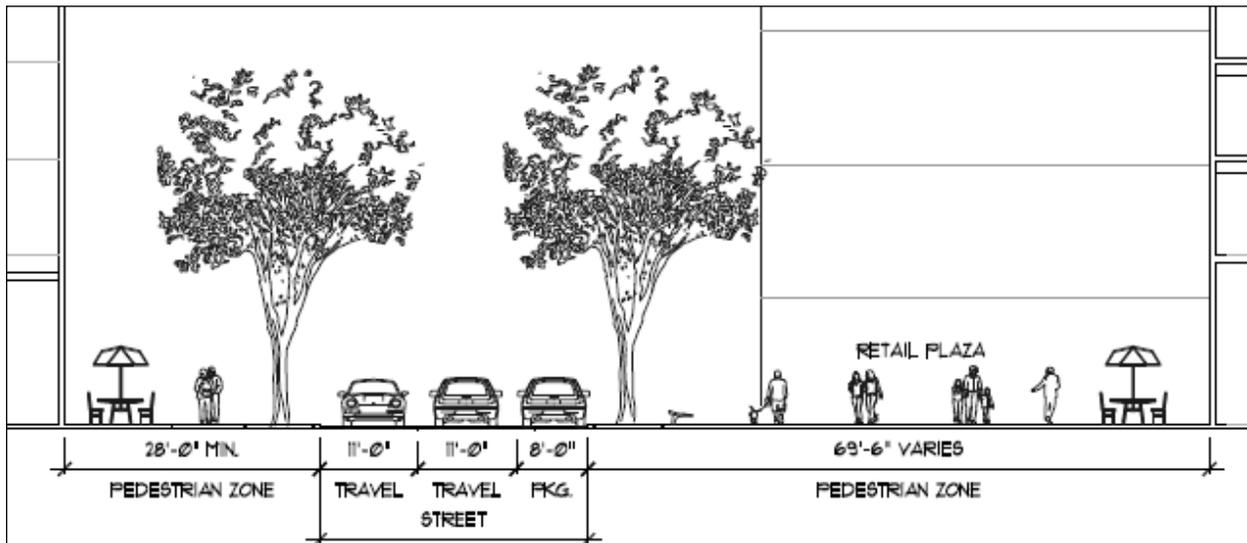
The cross sectional view of the central retail plaza, with west on the left and east on the right (Source: Cunningham Quill Architects, PLLC – March 15, 2013)
